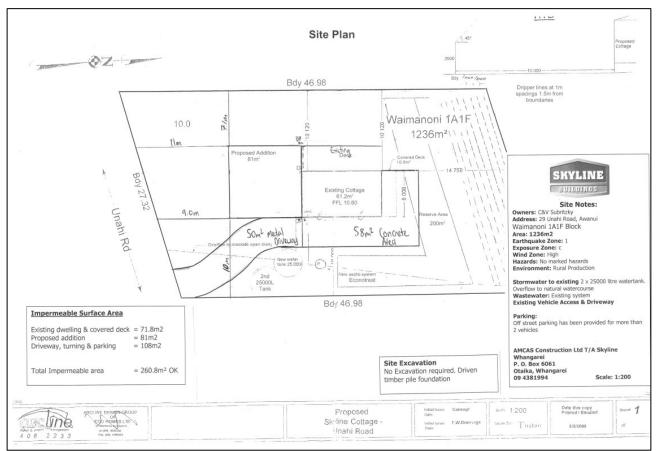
Snip of Proposed Site Plan Provided by Skyline Buildings
